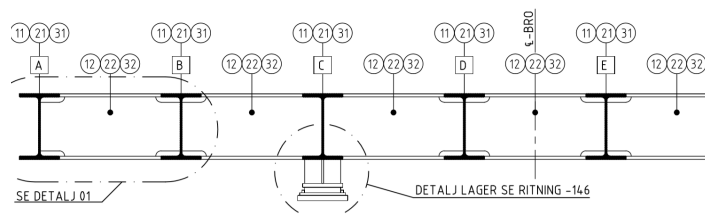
Connection between the longitudinal HEA500 beam members. [7].
